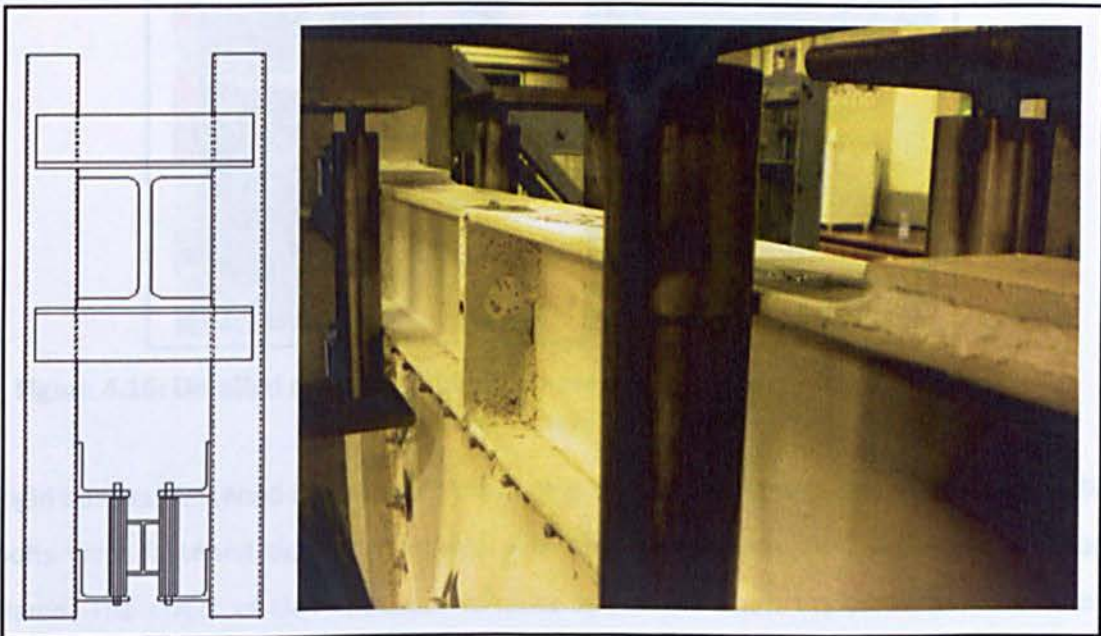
Lateral supporting system (out-of-plane bracing) for quasi-static tests
